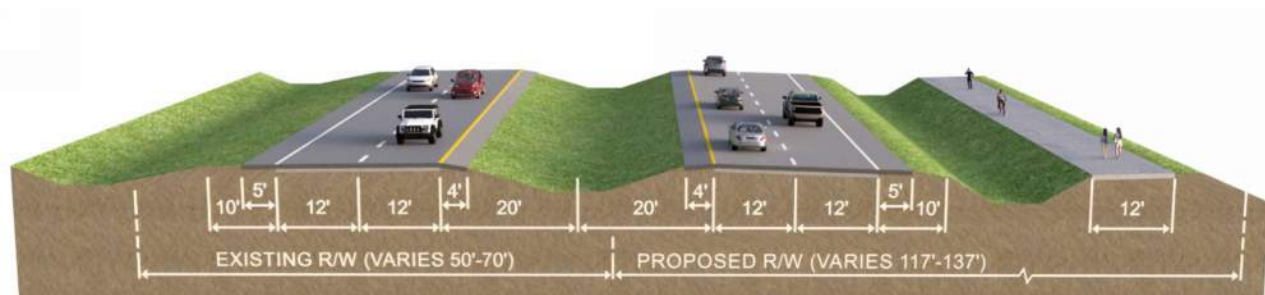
SR 70 – Proposed Roadway Typical Section One
